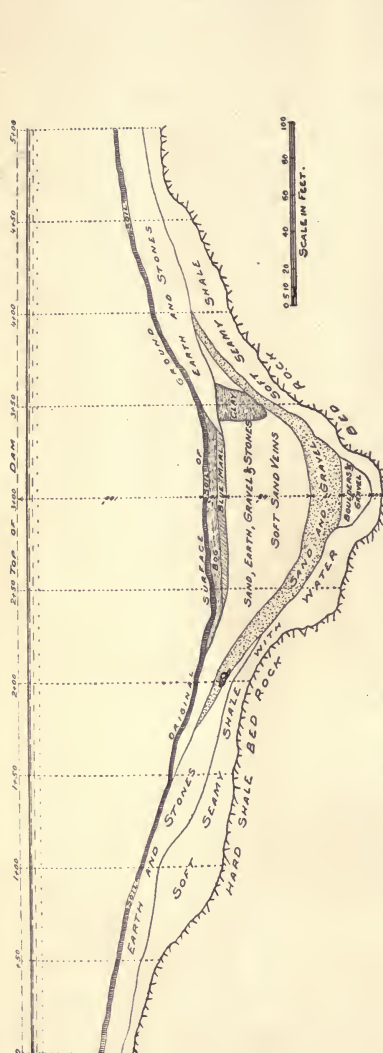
LONGITUDINAL SECTION OF YARROW DAM SITE.
